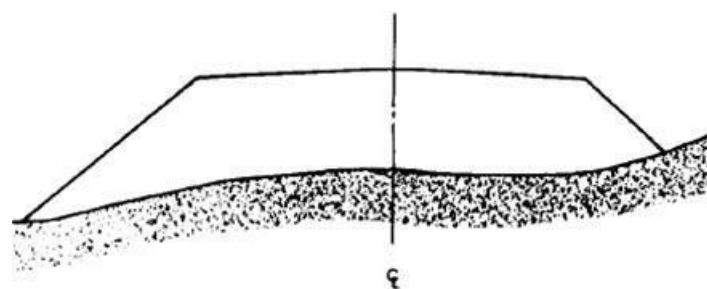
Typical Fill Cross Section. (Source: Venkatramaiah, 1996)
